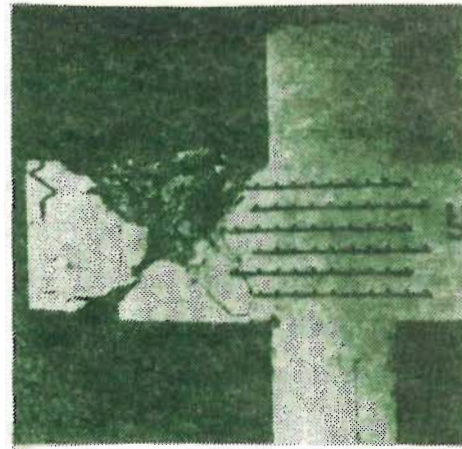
Failure of a test specimen at the connection of a beam to the column when the central zone of the joint is reinforced with mesh (A. P. Vasiliev, et al, U.S.S.R.)
